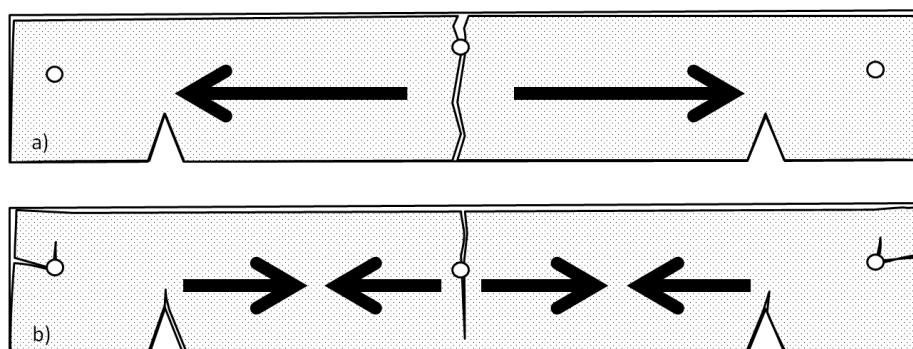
Illustration of cracking and shrinkage observed for: a) Shrinkage cracking mould with 10 mm steel bar at centre of mould with 20 mm concrete cover. b) Shrinkage cracking mould with 10 mm steel bar at centre of mould with 40 mm concrete cover.
